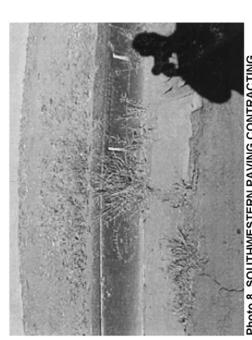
SOUTHWESTERN PAVING CONTRACTING COMPANY. Street name sign location. NW comer at Fillmore.
